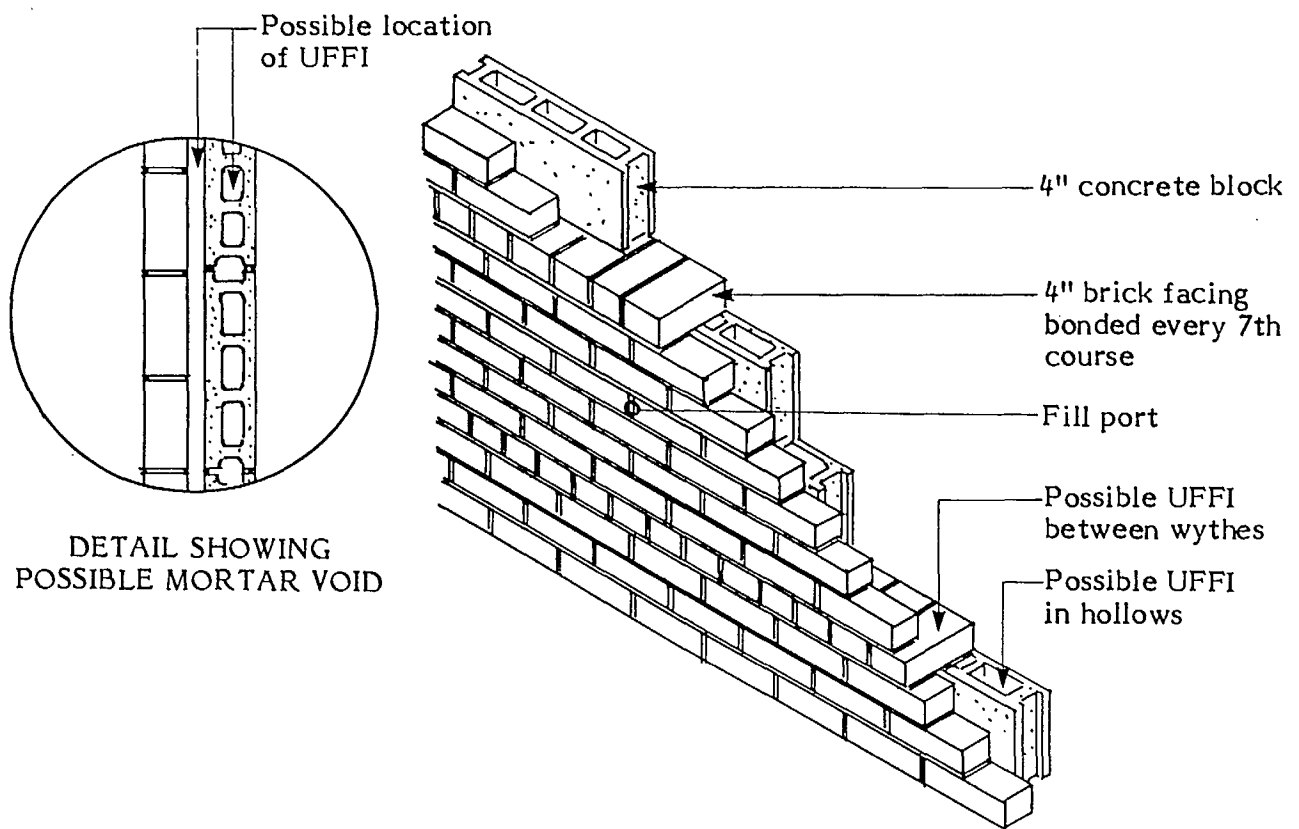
8" BRICK AND BLOCK BONDED MASONRY WALL
